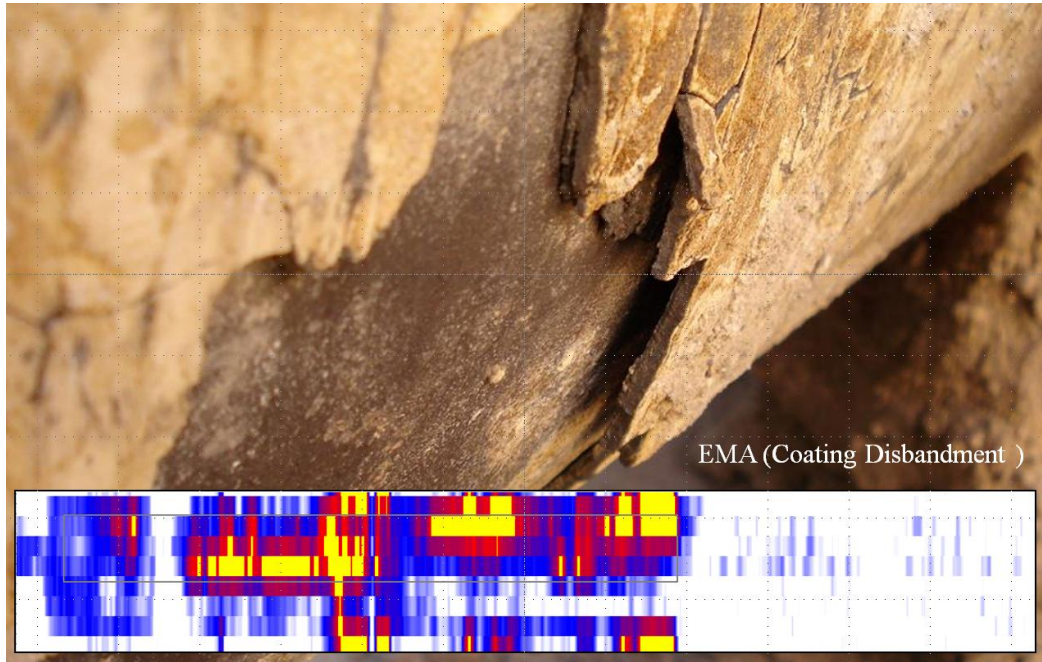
EMAT ILI Tool. Detection of disbandment coating zones
